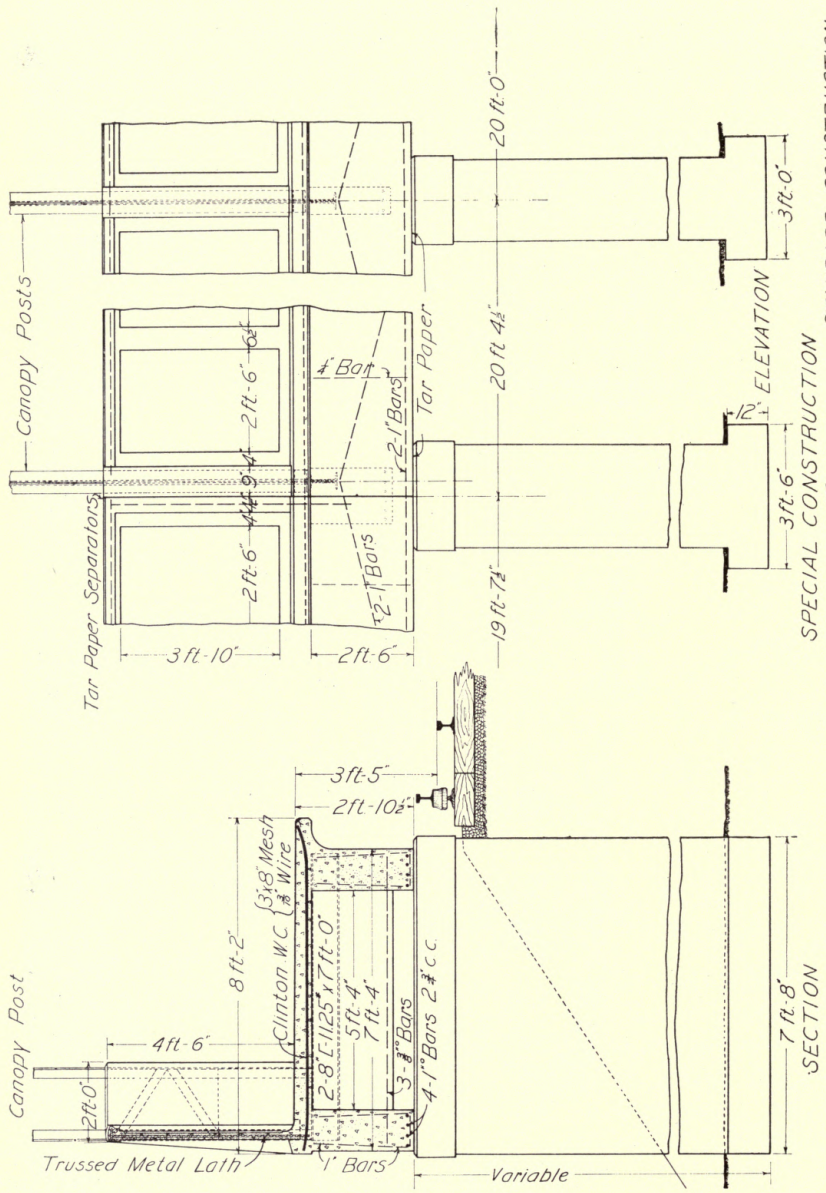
DETAILS OF CONSTRUCTION, STATION PLATFORMS, B. R. T. CO.
